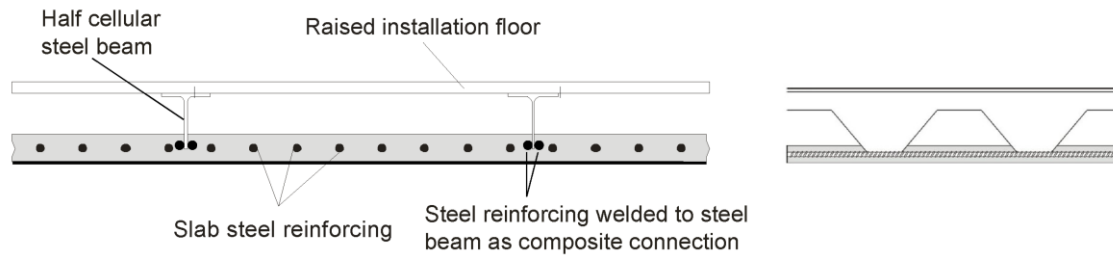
Novel type of composite slab with integrated installation floor using cellular beams: the concrete slab is placed on the bottom
